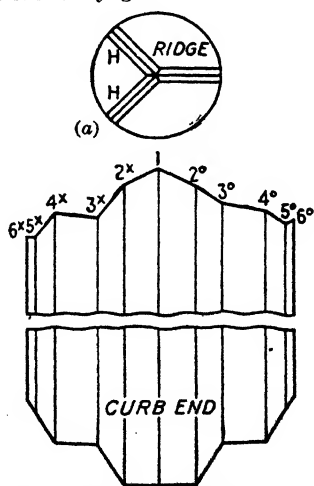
Intersecting hip-bar miters at hips and ridge H. (a) Plan of intersecting hip bars H.
